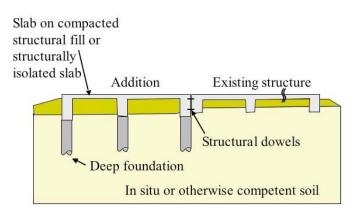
Mixed Depth System for Building Addition with Deep Foundations
